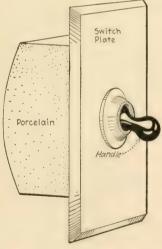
Flush toggle or tumbler switch and switch plate, with switch box removed.
